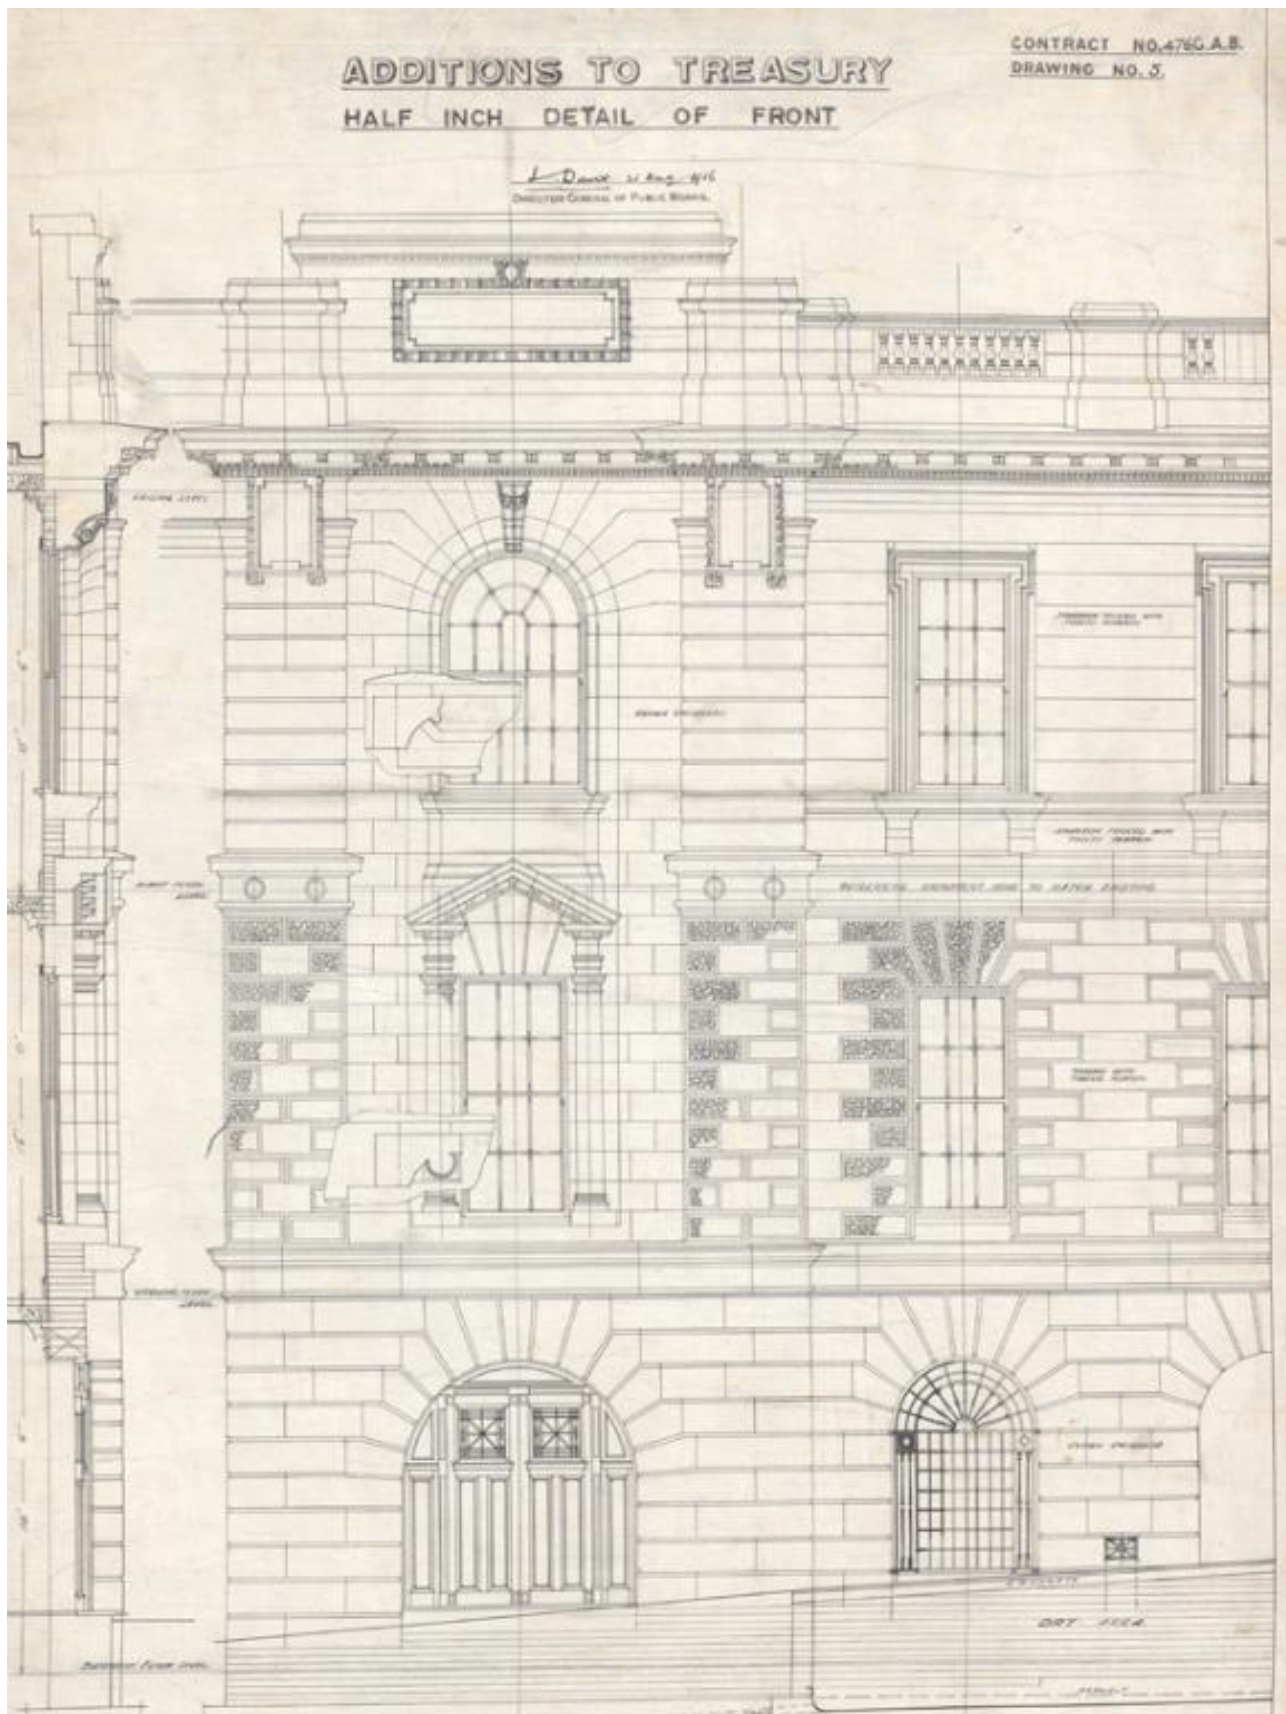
Additions to Treasury by George McRae in 1916 (Half inch detail of front – Bridge Street elevation) showing elevation as constructed
